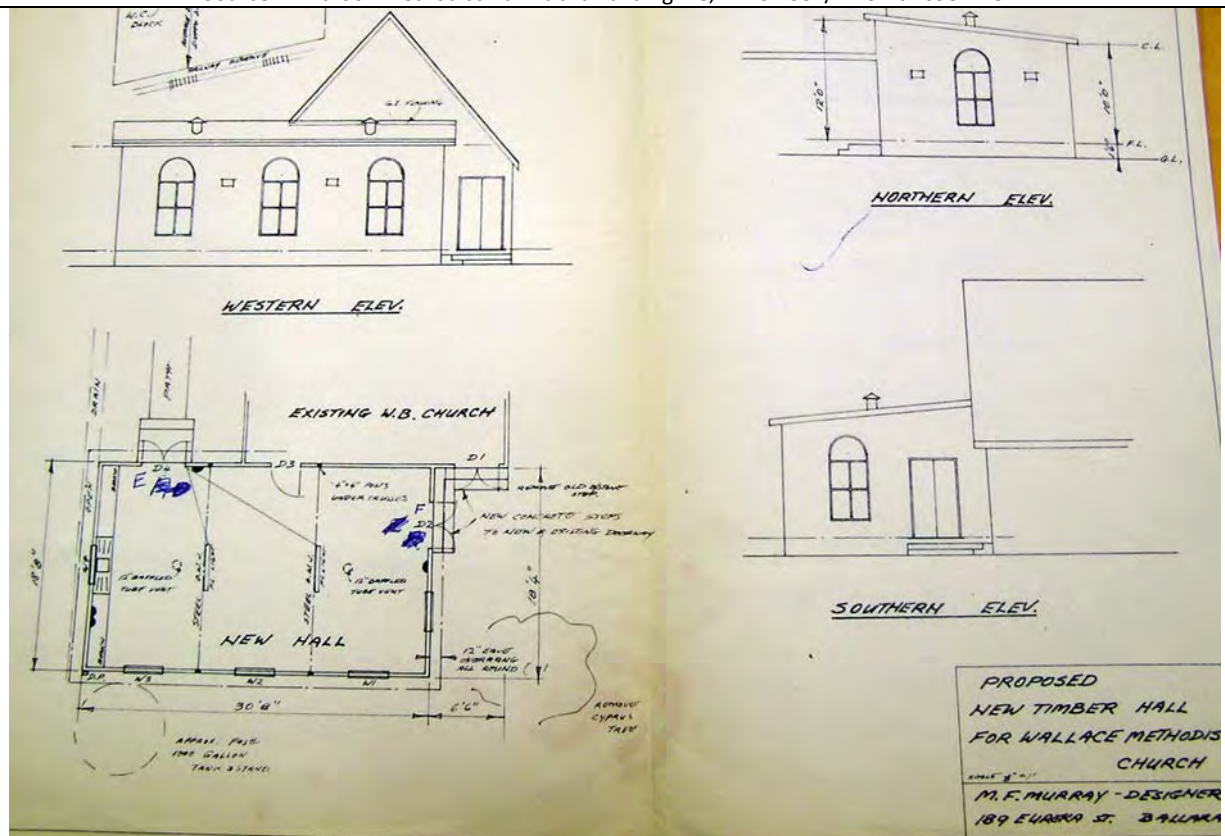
M.F. Murray, Floor Plan & Elevation drawings of the proposed additions to the Wallace Methodist Church, 1965.
